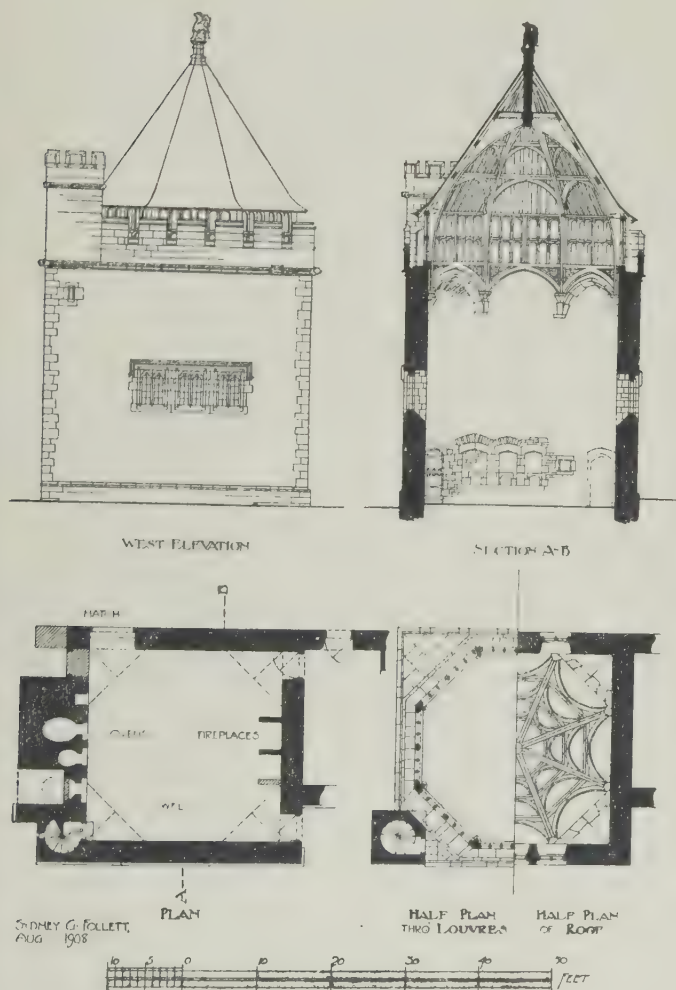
The Kitchen at Stanton Harcourt—Plans, Elevation, and Section.
